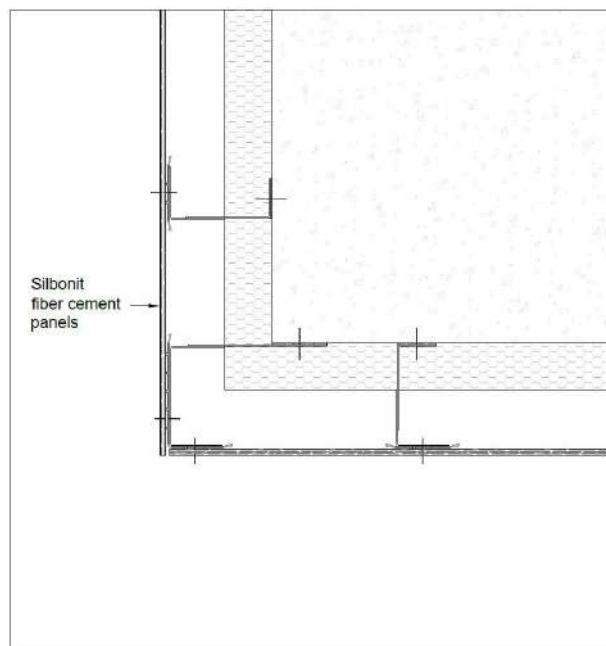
Example of a horizontal section of the ventilated facade package along an external corner with an open vertical joint between the cladding panels. Aluminum subframe.
